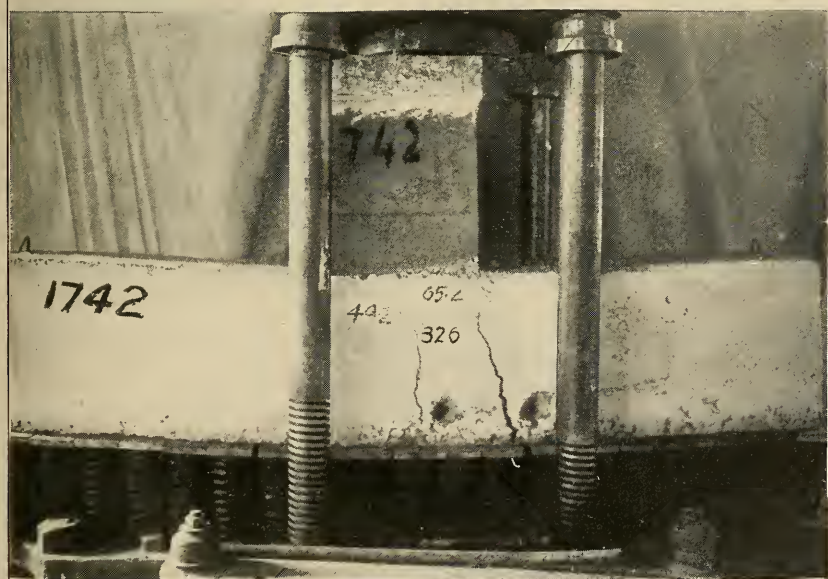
VIEWS OF REINFORCED CONCRETE WALL FOOTINGS AFTER TEST.
